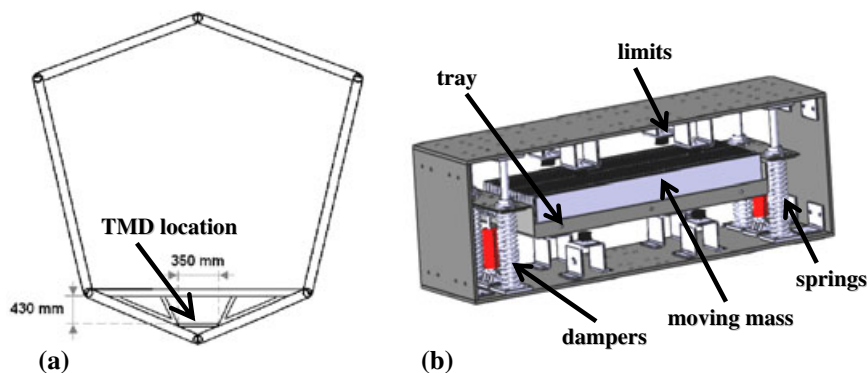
(a) Footbridge cross section and TMD location under the timber walkway. (b) CAD model of the TMD.
